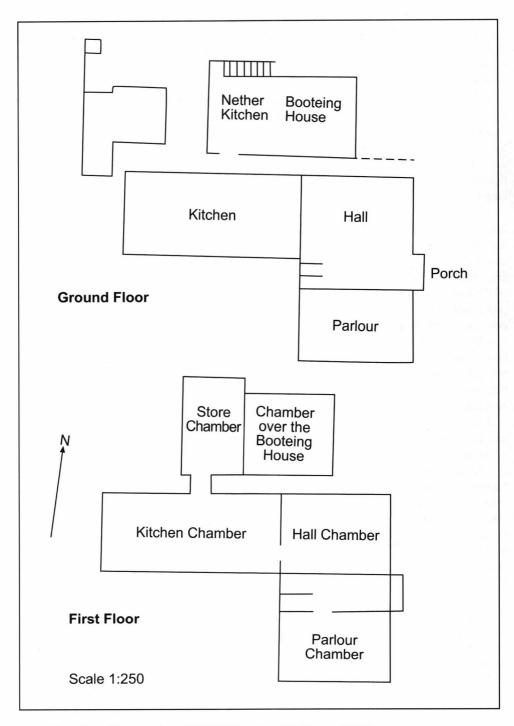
Floor Plan of Bearwardcote Hall 1683 based on Kitching et al 1983.
